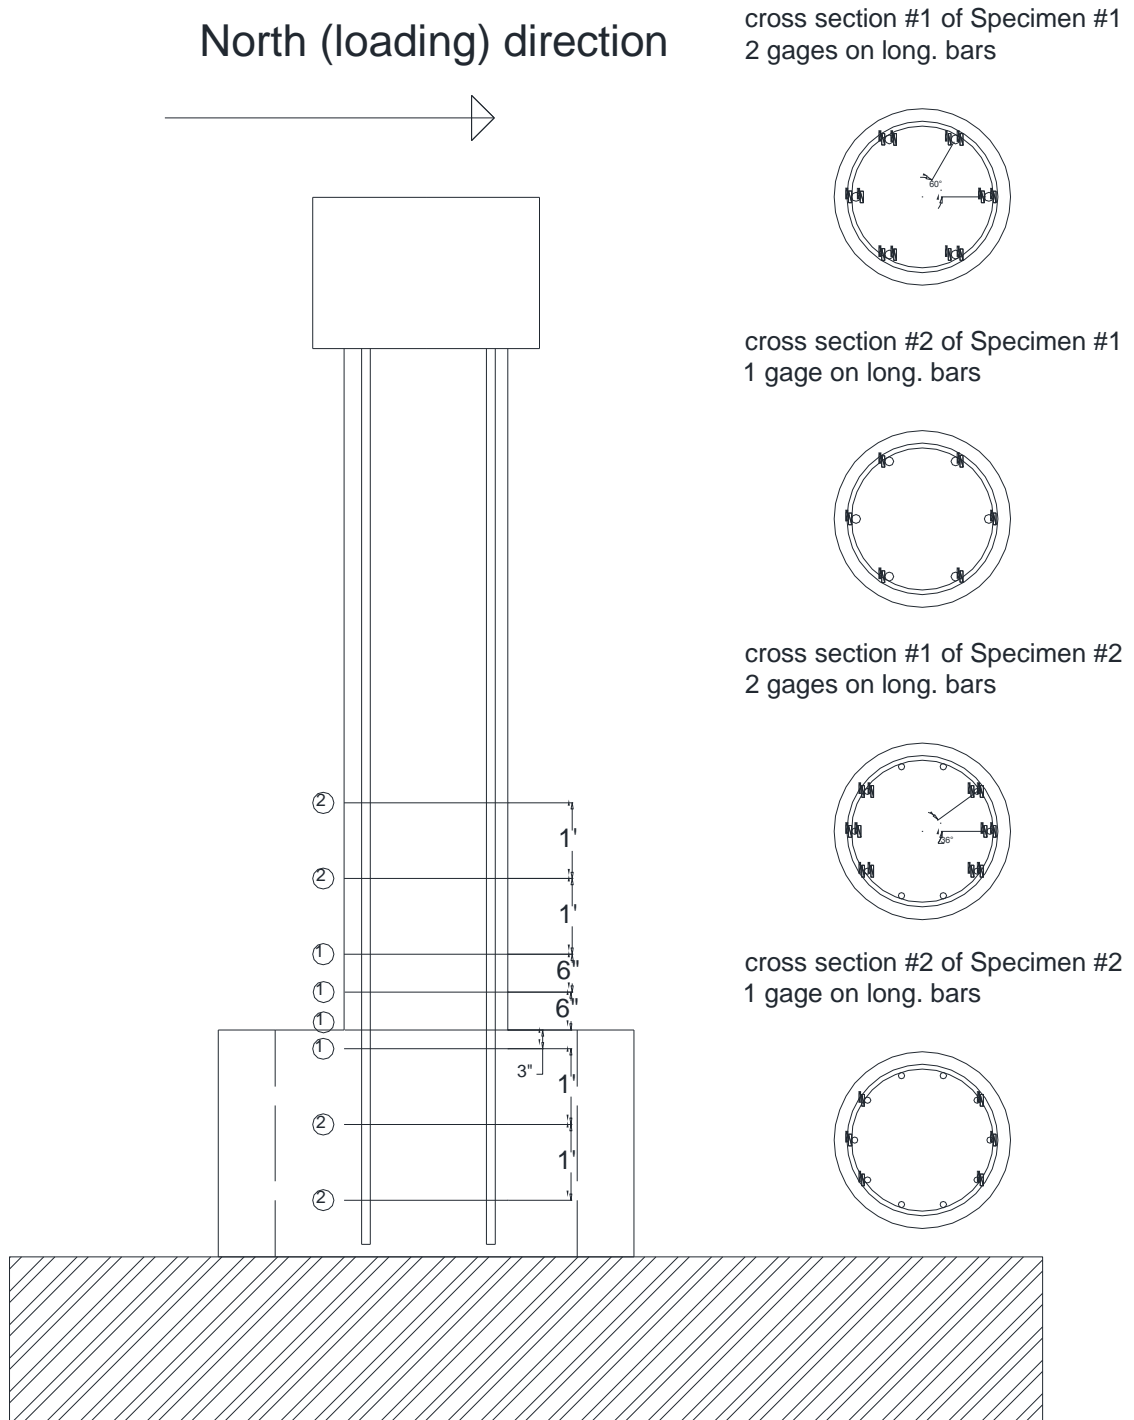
Strain gages on longitudinal bars of Specimens #1 and #2
